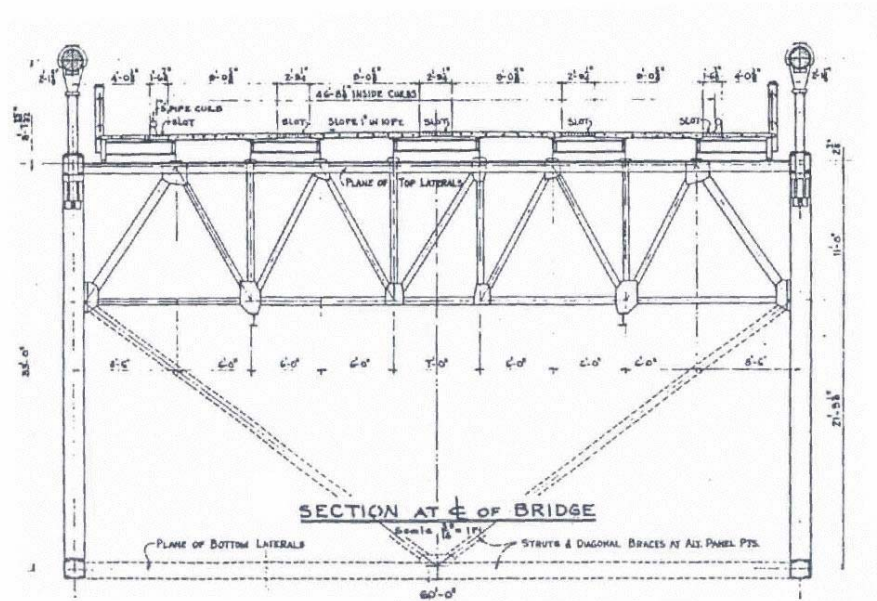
Tacoma Narrows Bridge Floor Truss.
